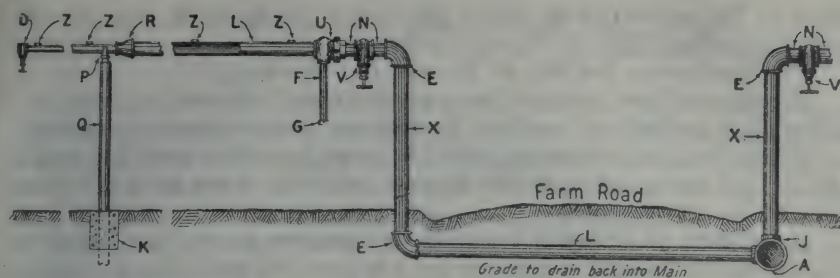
Typical fittings for overhead nozzle lines connected to main feed pipe and method of crossing a farm road.
